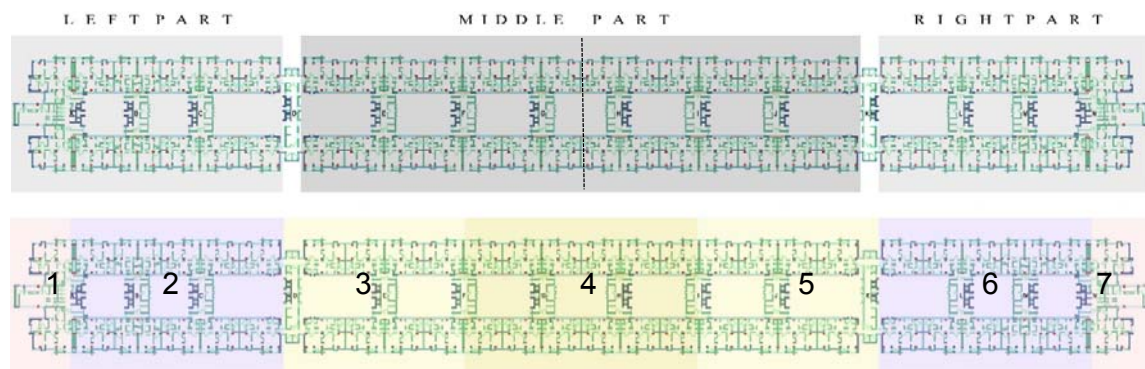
Typical floor plan of Building 6. Showing the symmetry on top and the lamellas on below (Rahman, SMM 2018).
